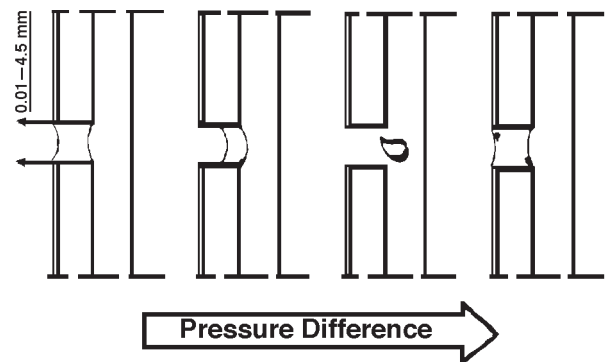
Water penetration in small openings and cracks is caused by pressure differences over the cladding.
